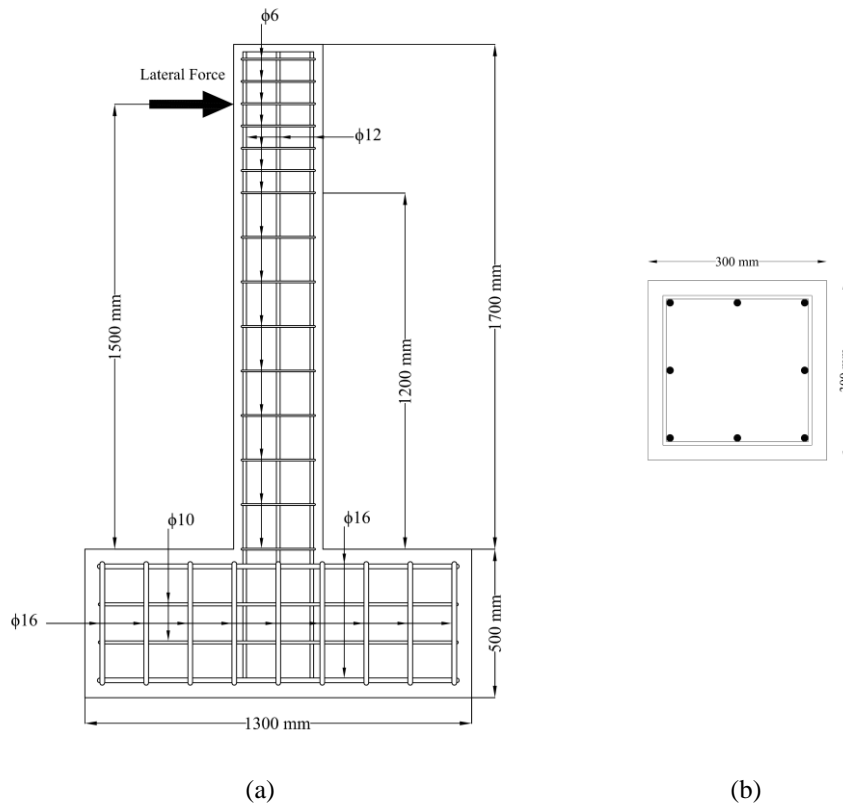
Geometry and reinforcement details of specimens PB01-N13, PB12-N15, and PB12-N16: (a) elevation, (b) cross section
